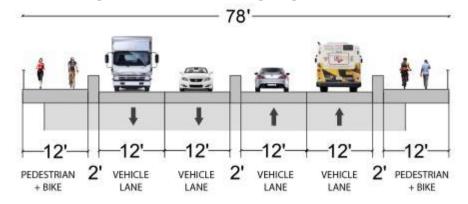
NEW FOUR-LANE BRIDGE AND DEMOLITION OF EXISTING BRIDGE
